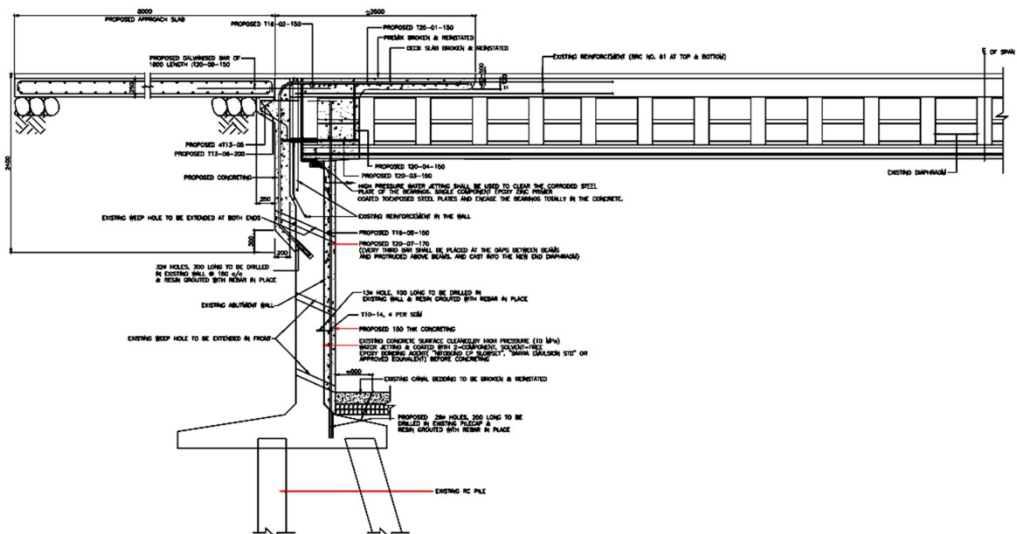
Abutment retrofitting in a retrofitted bridge in Singapore (Jayaraman & Merz, 2001)
